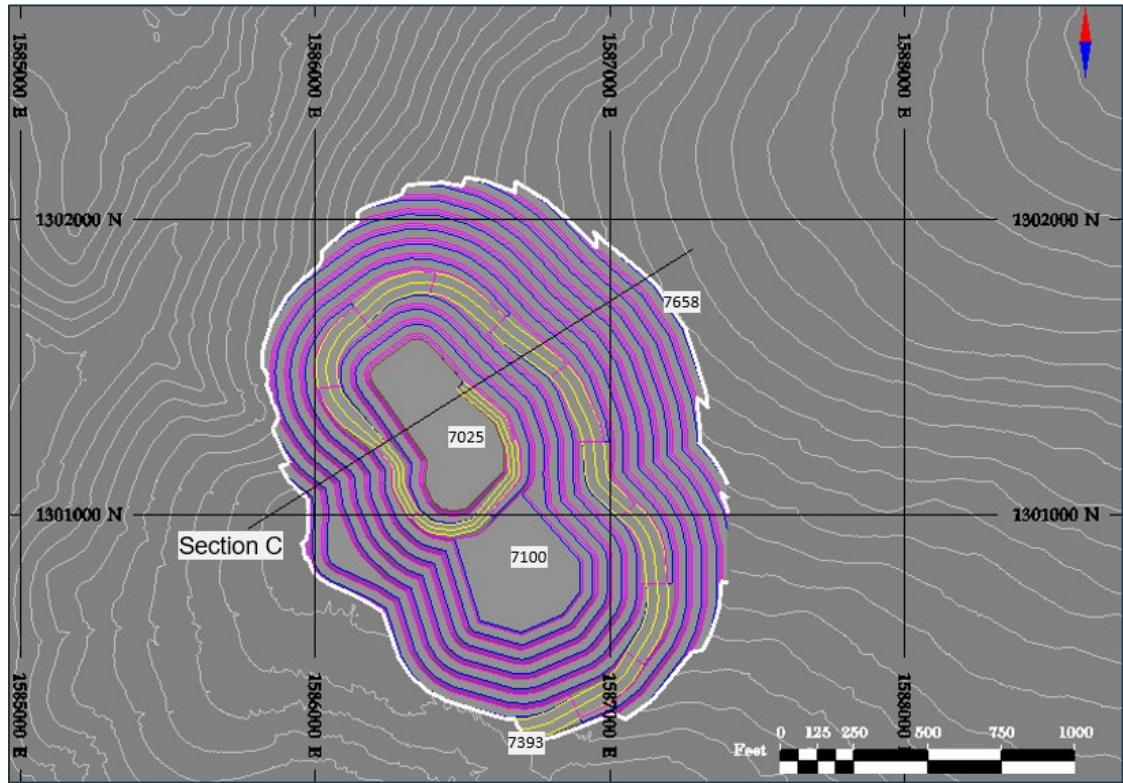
Ultimate Pit Design – Beartrack South Pit (Source: Wood, 2020)
